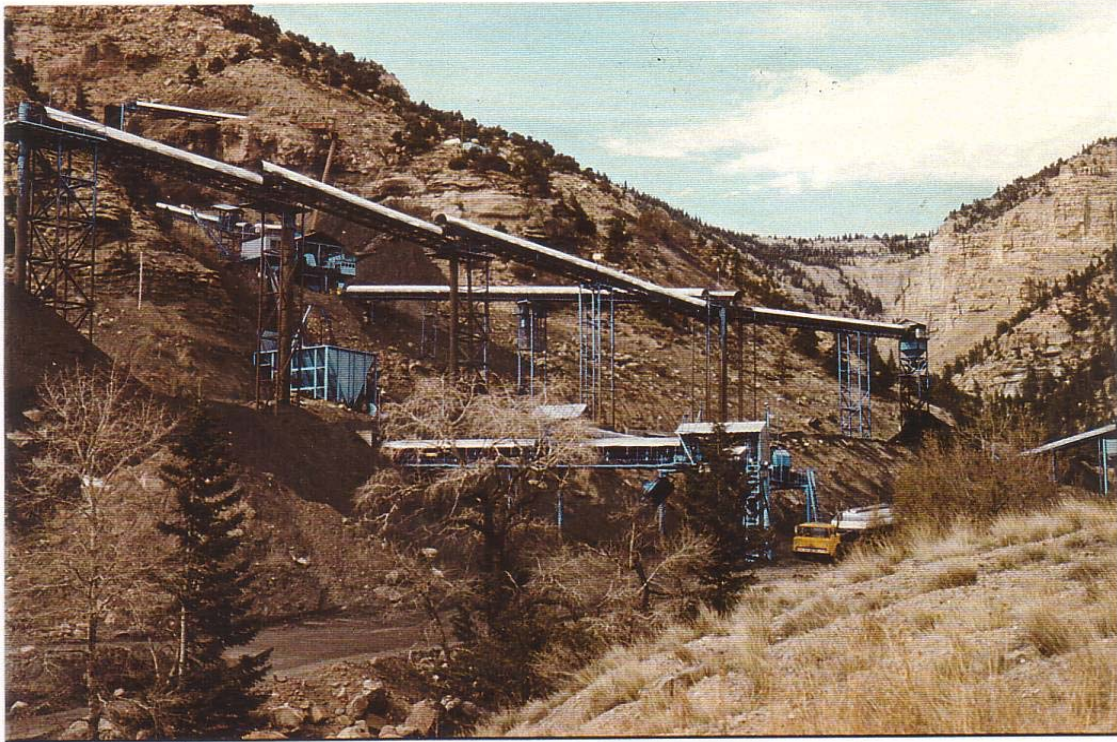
Truck Loading Facility, Oil Slack Loading Facility, Storage & Stacking Facility
